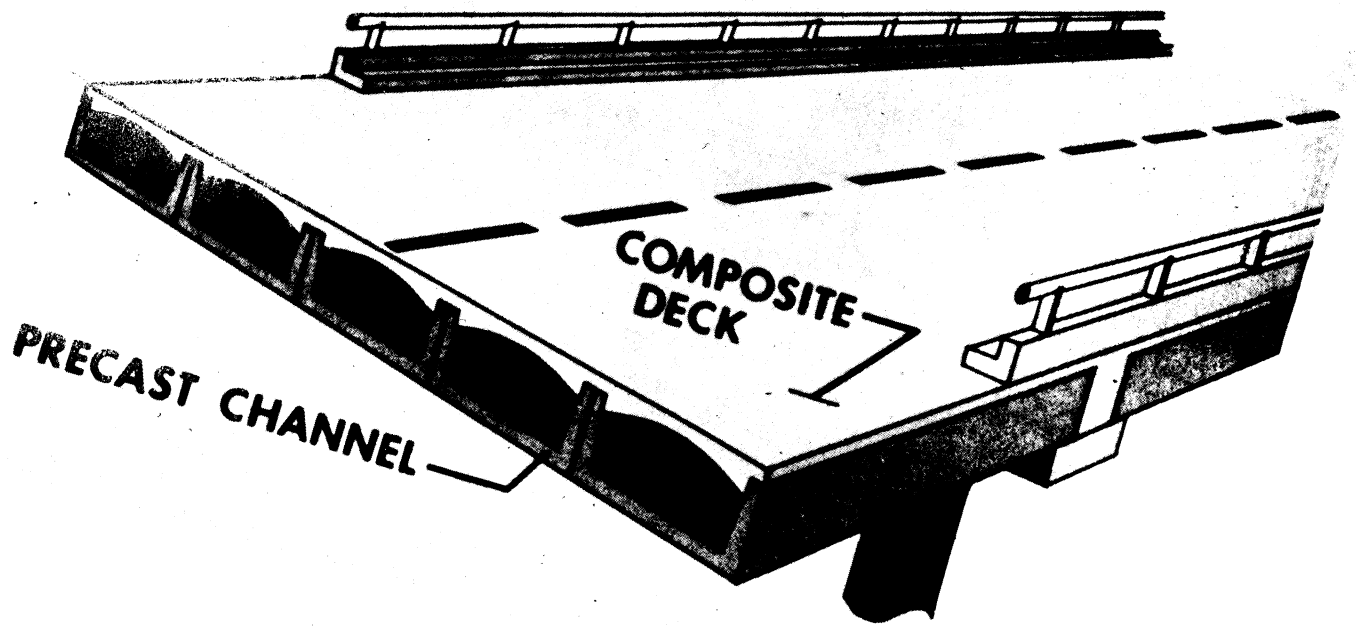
Precast channel bridge system proposed by Missouri Highway Department. (135)
